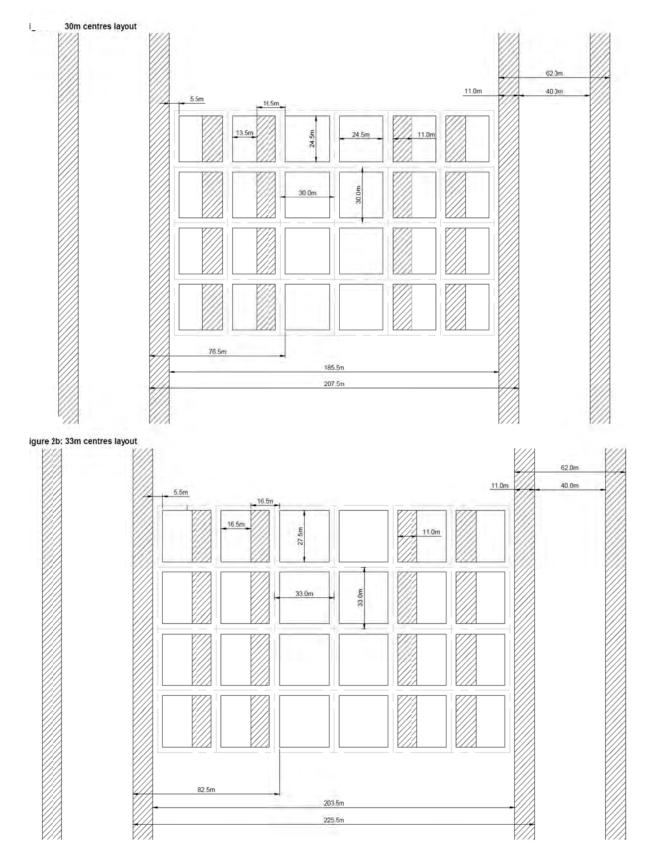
Typical Layout for Seven Heading Partial Extraction Layouts, 30m and 33m centres (Golder, 2013b)
